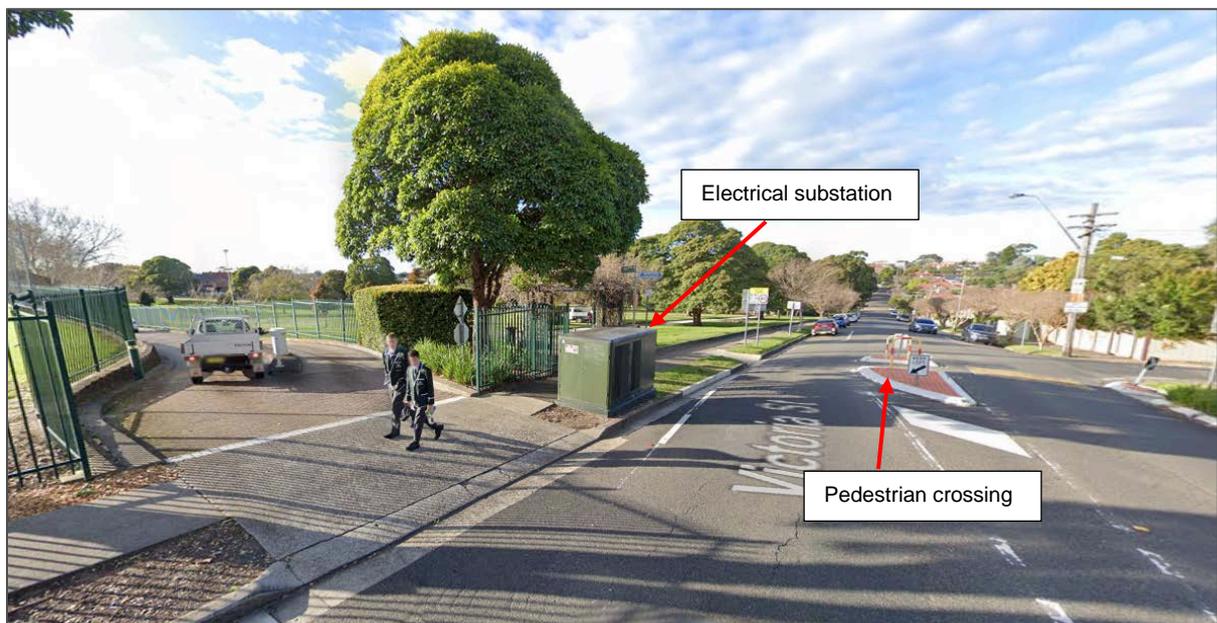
| Existing southern access driveway and adjacent electrical substation and pedestrian crossing (Source: Google Maps, 2021)
